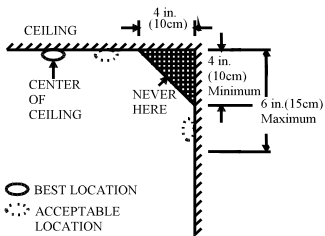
Recommendations for best and acceptable installation locations for installing smoke & heat detectors.
